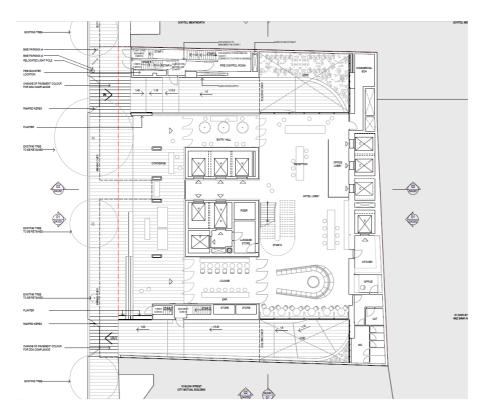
| Proposed ground floor plan (Source: Woods Bagot)
